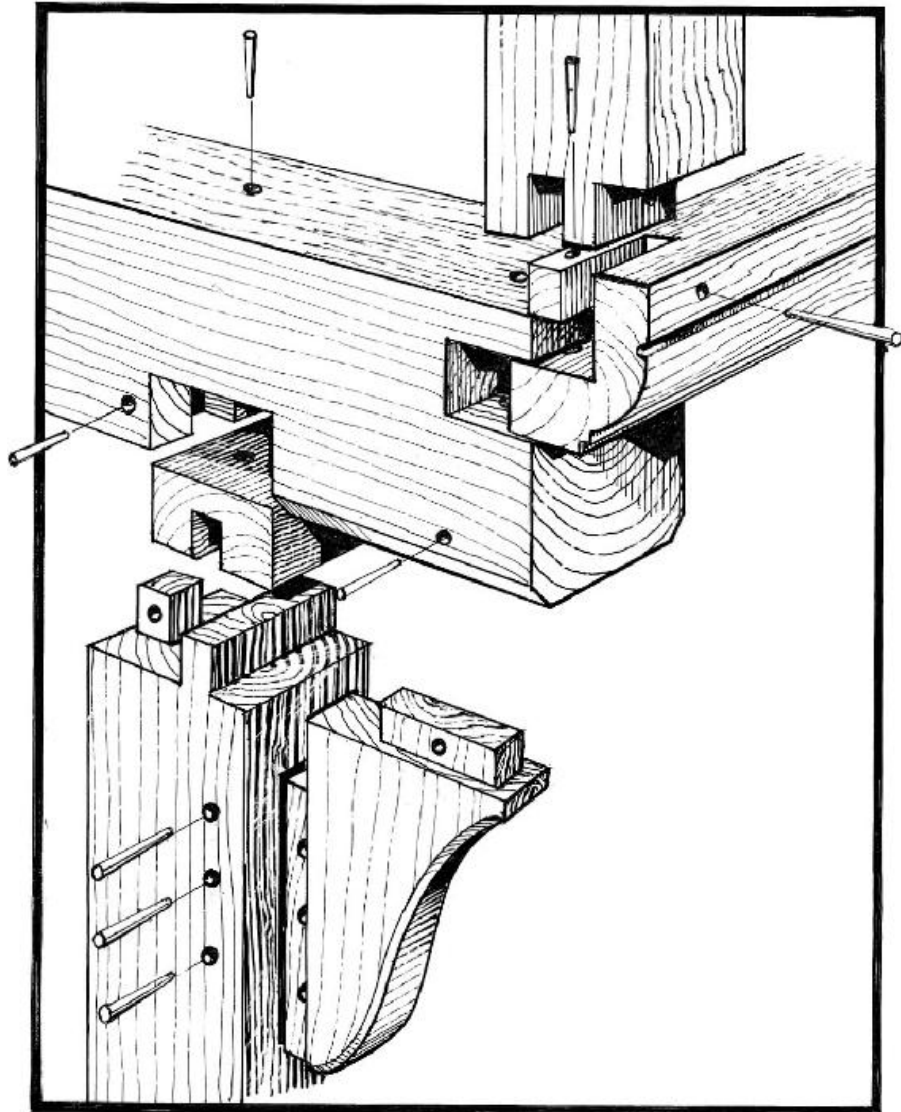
Exploded detail of the construction of the jetty of the central range of 14 Church Street, showing the 'L-section' bressumer (right)
